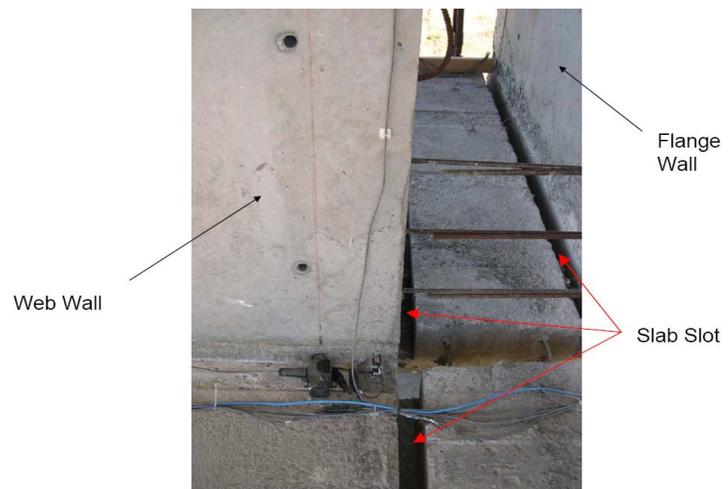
Slotted slab. Benchmark documentation provided by the UC San Diego; courtesy of Prof. Restrepo.
